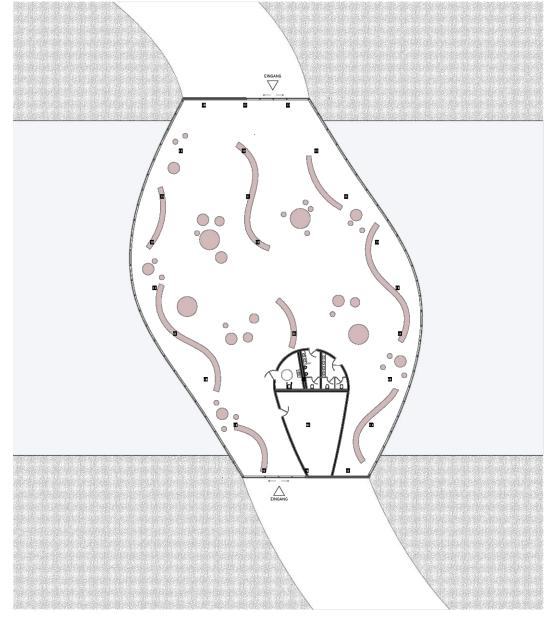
Floor plan - Building is used for art exhibitions
